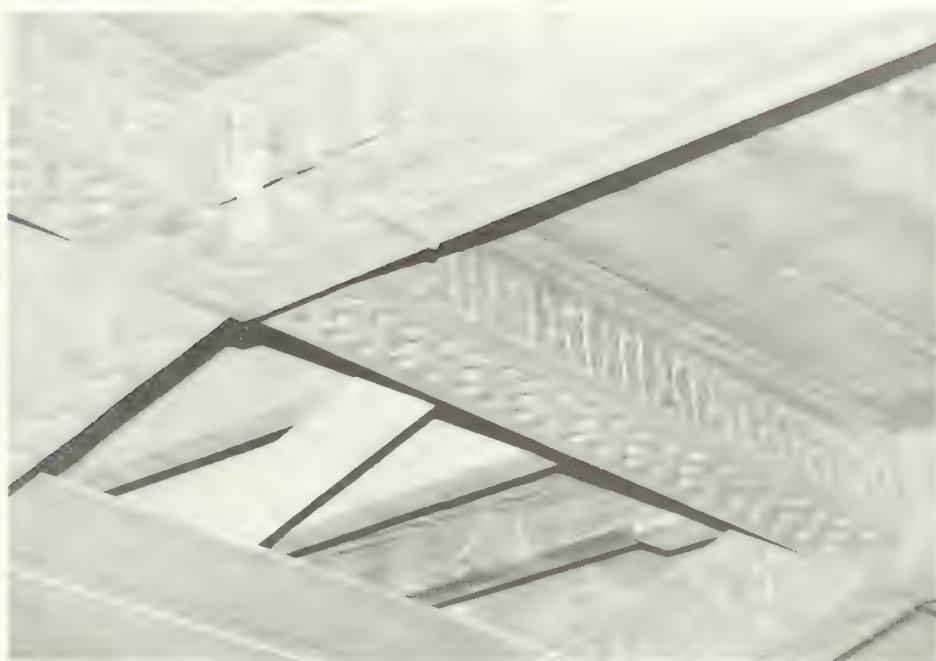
Detail of Dining Room decorative ceiling. Wood failure has occurred because of extreme heat and dryness. With several pieces of ceiling boarding removed, the second floor joists can be seen. (Photo by R. Silva)
